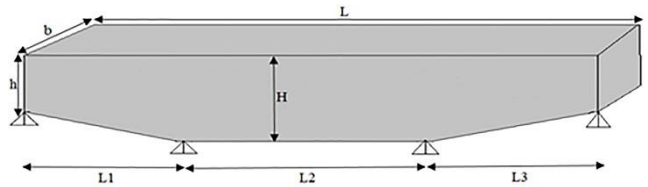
Non-uniform reinforced concrete beam with different height of opening in the length of beam
